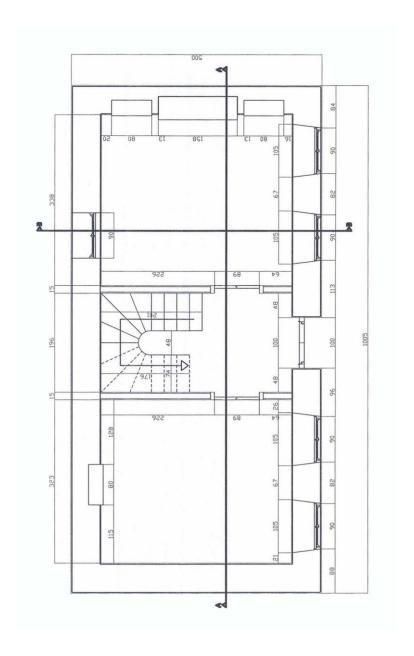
Ground Floor Plan of 11-Hamam Street Scale: 1/75
